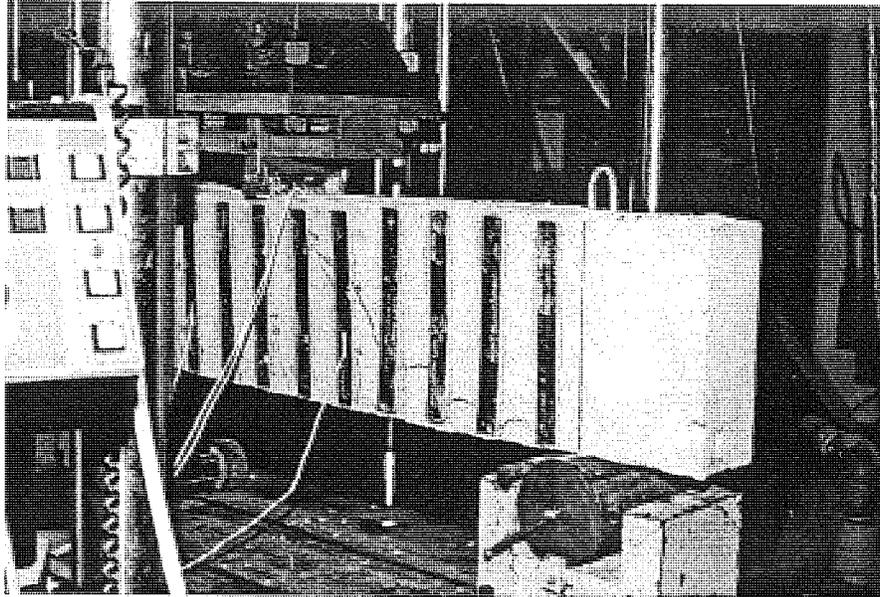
Shear failure due to delamination of CFRP strip in Beam No. 3
